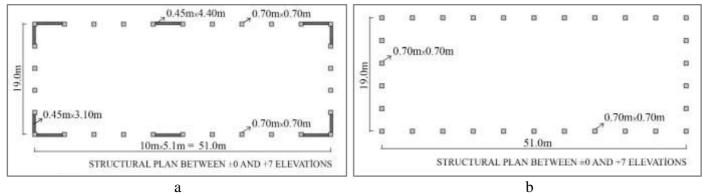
An example of an undamaged hinged building (Ground floor(a) and first floor(b) structural system plan) (Özden et al., 2012).
